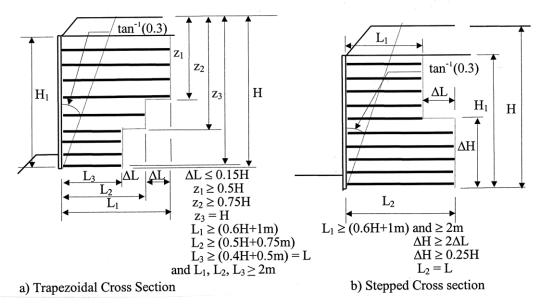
Special Requirements for Trapezoidal and Stepped Cross Sections
